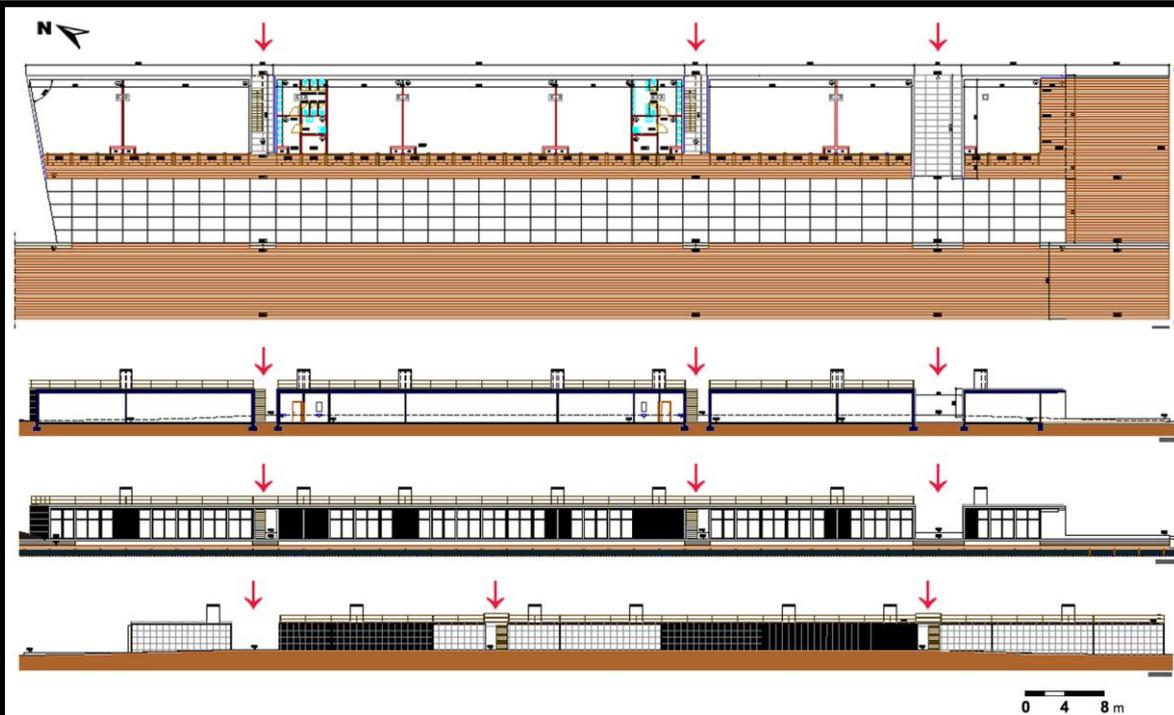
Plan, longitudinal section and two elevations of the Docks' complex
